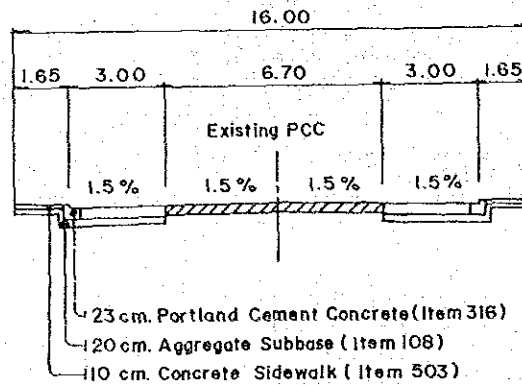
PROPOSED IMPROVEMENT ALONG CABANATUAN CITY URBAN SECTION
